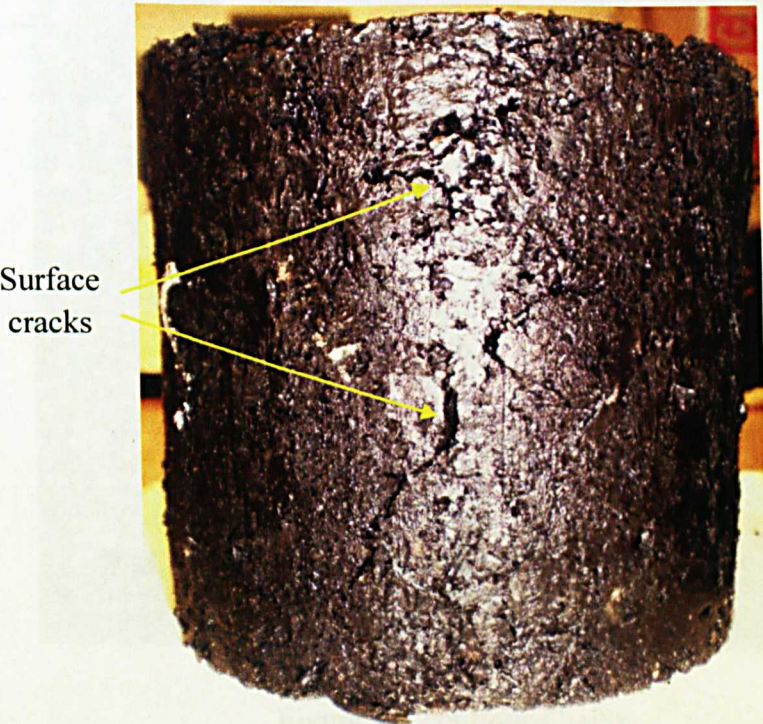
Deformed specimen of rubberised mixture (test stopped at peak stress)
